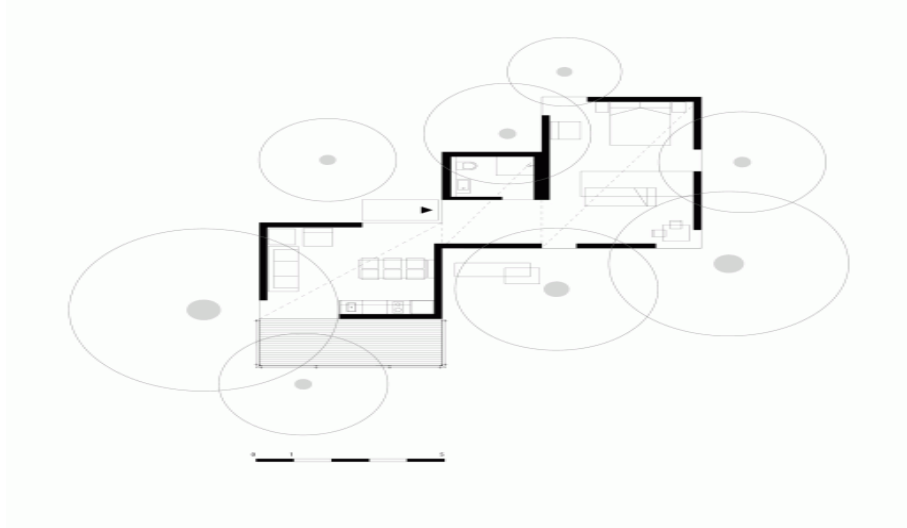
Plan of Parque de Pedras Salgadas (<http://www.pedrassalgadapark.com/pt/>)
